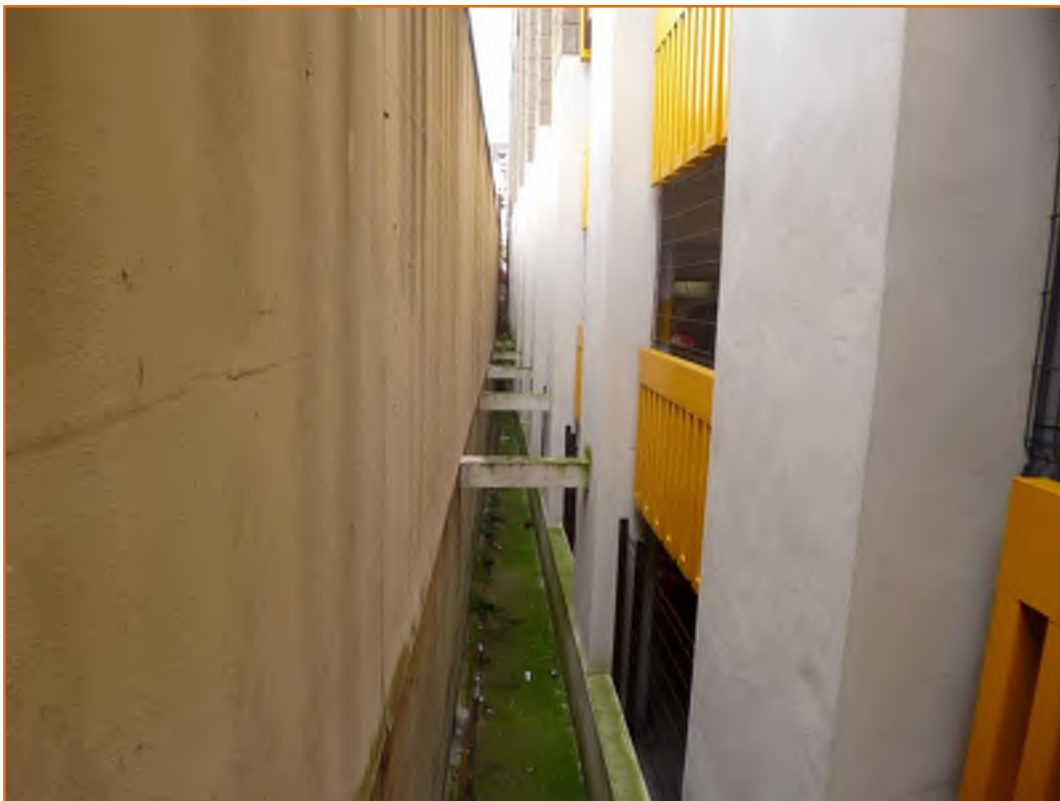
View facing northeast showing props in tapering gap between Sutherland Court car park retaining wall and multi-storey car park.
